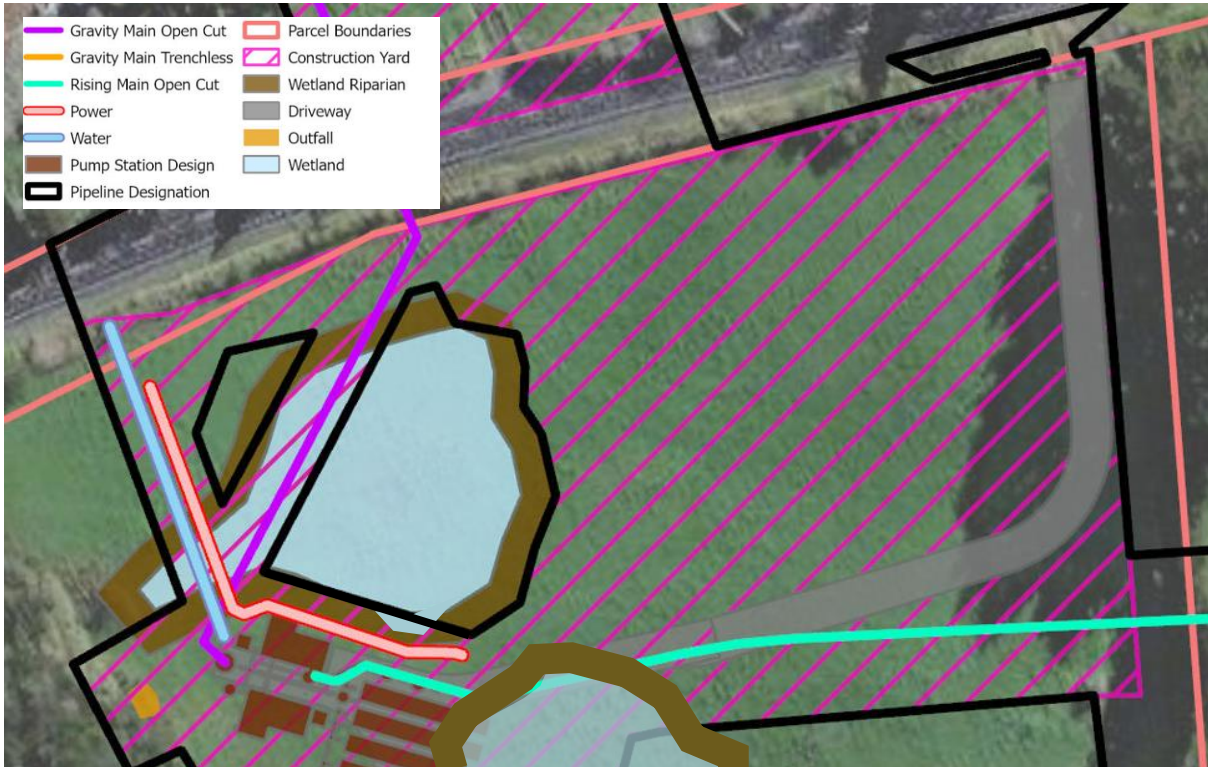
Permanent and temporary access to the pump station (shown in grey)
